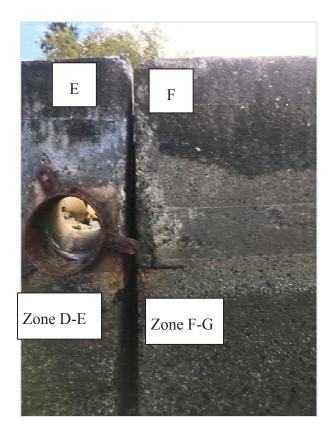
Zones D-E & F-G. Source: Reid Middleton Site Visit 10/18/2016
